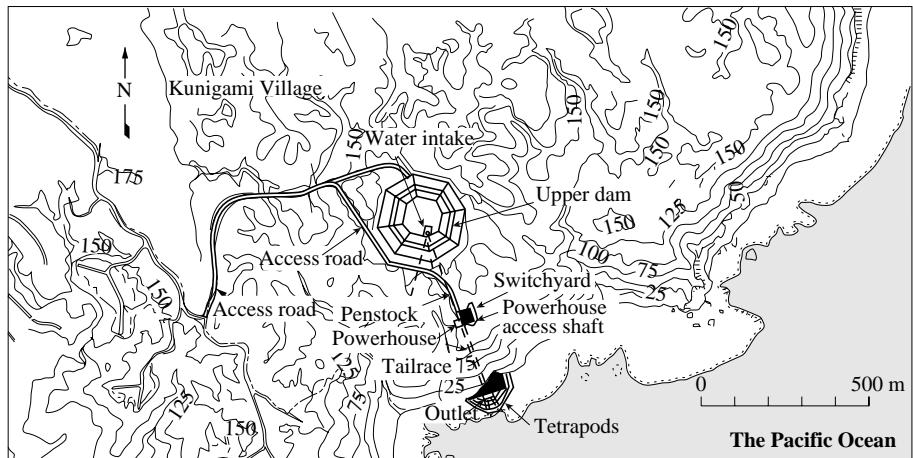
Plan View of Seawater Pumped-storage Power Plant. The octagon-shaped upper dam is located 500 m away from seashore at the elevation of 150 m.
